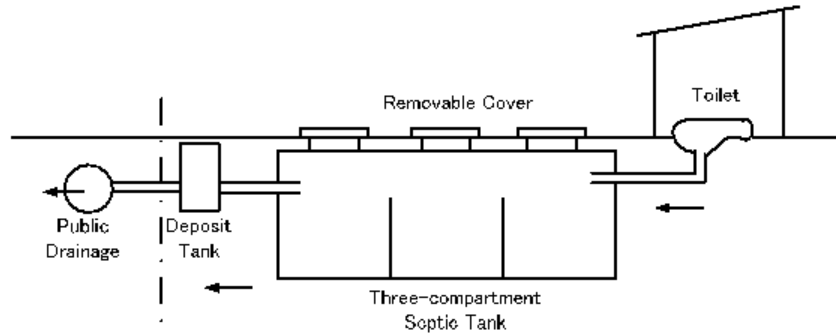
Conceptual Drawing of Foul Water Drainage System
